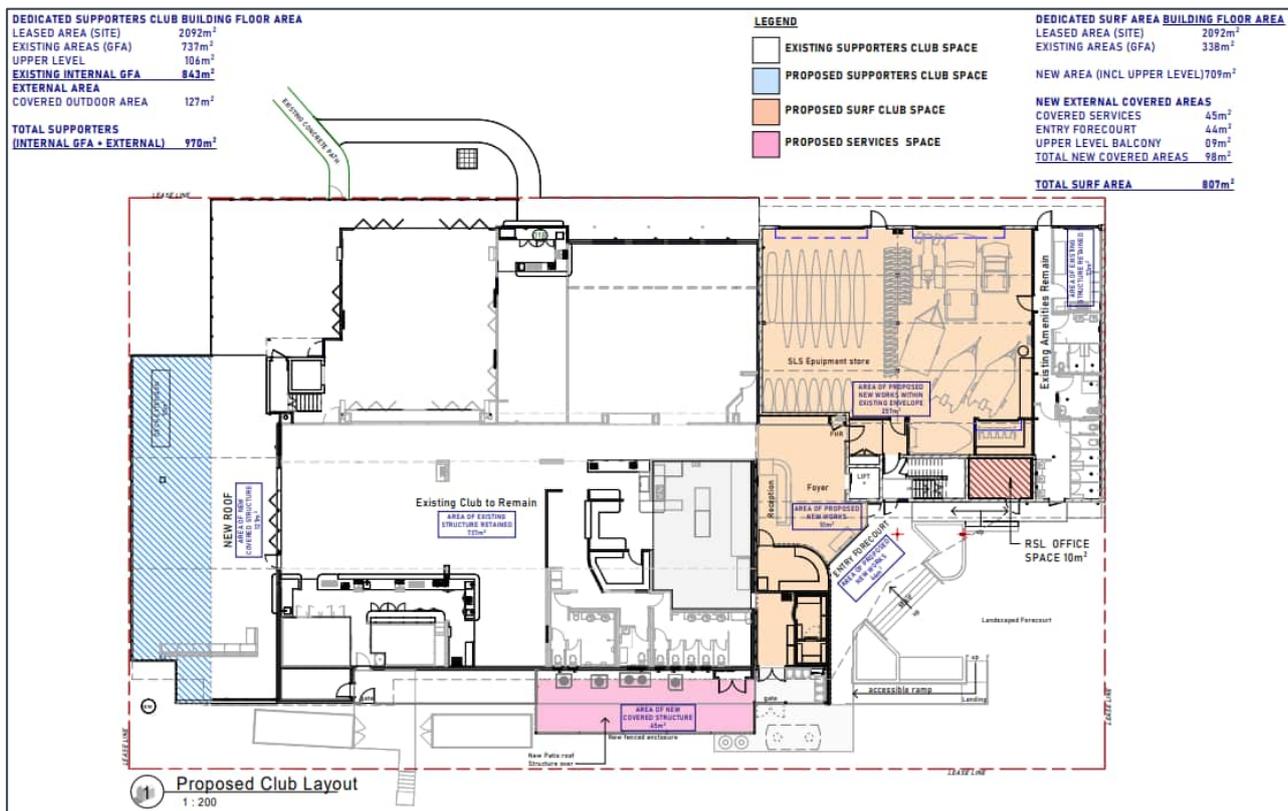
Ground Floor Plan of Proposed Surf Club Redevelopment
